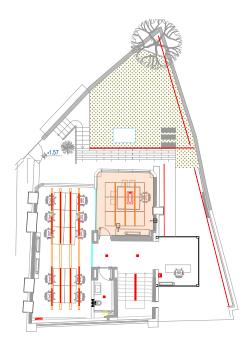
ERKE's Lighting Cell Office Layout in Ground Floor
